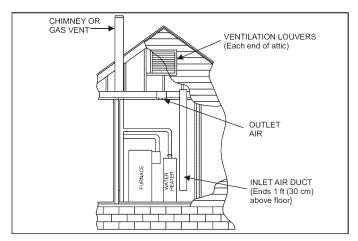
Air Inlet, Outlet and Chimney Connections
